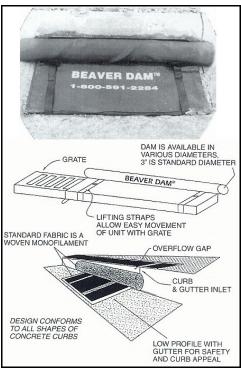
Example installation and diagram for Beaver Dam™ storm drain inlet protection (*Dandy Products, Inc., 2001*).
